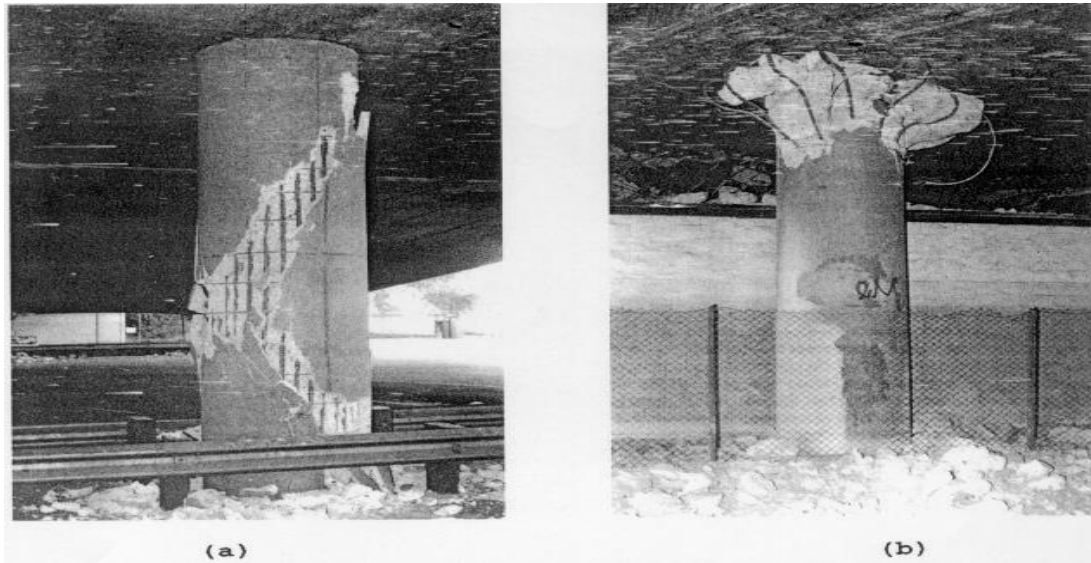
Typical Column Failure Modes; Shear Failure, Northridge Earthquake 1994 (left);
